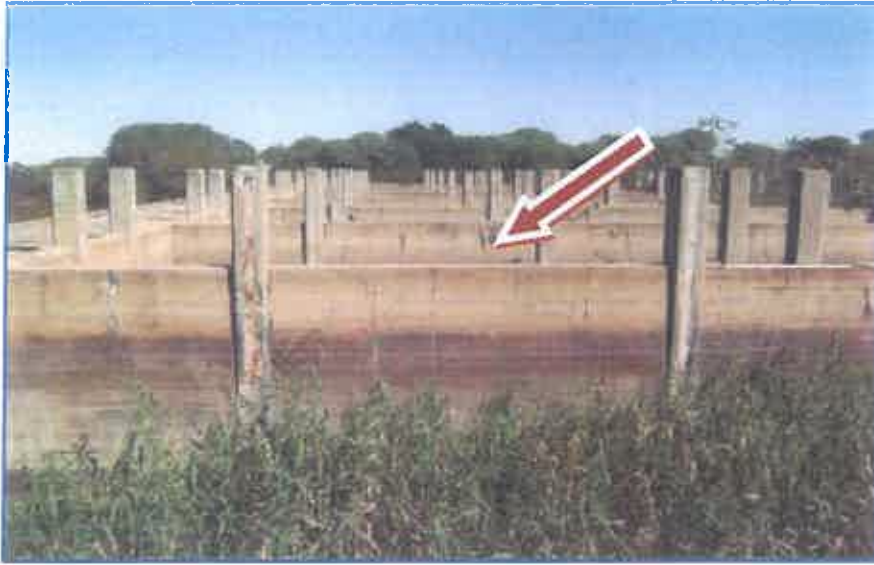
View of the abandoned waste water treatment works concrete structure noted on the proposed site.
